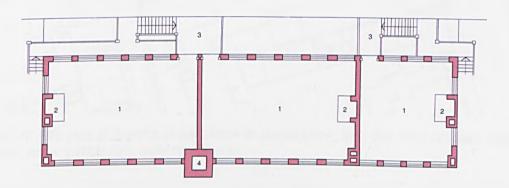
Second floor plan of Gaunt's wheel, scale 1:200 (author).
